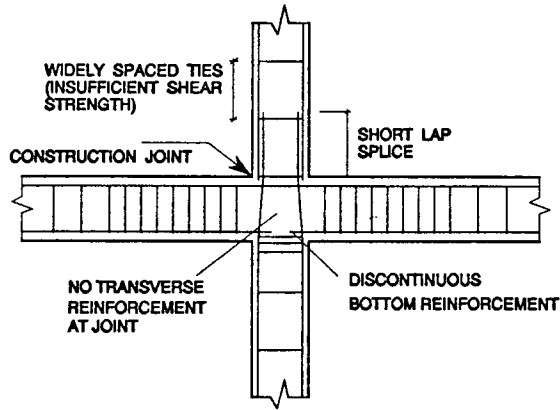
Typical deficiencies in existing reinforced concrete frames
